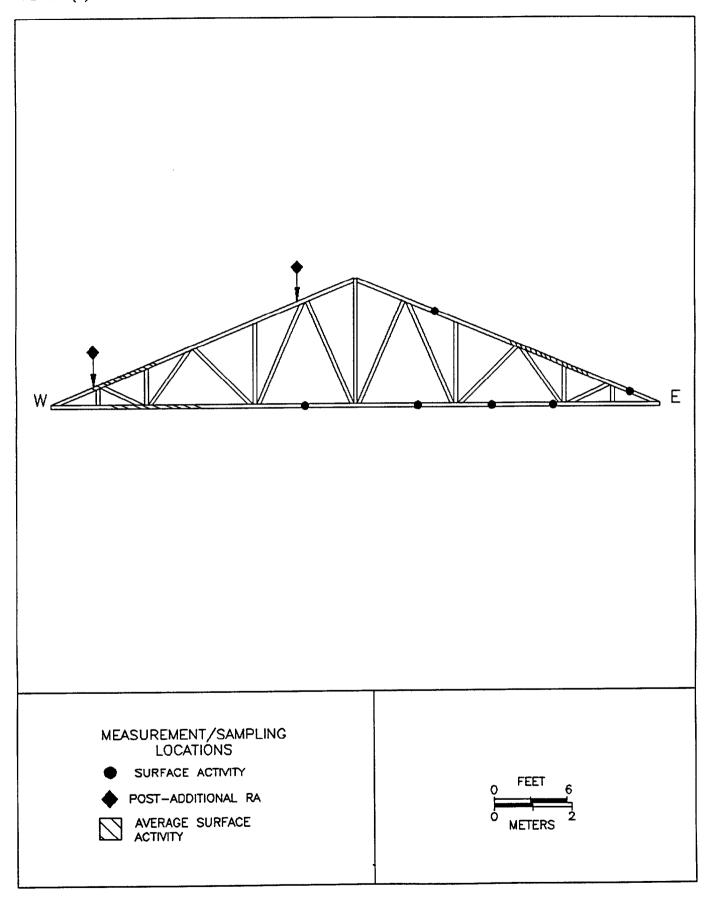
Building 3, Truss 8 — Measurement and Sampling Locations
